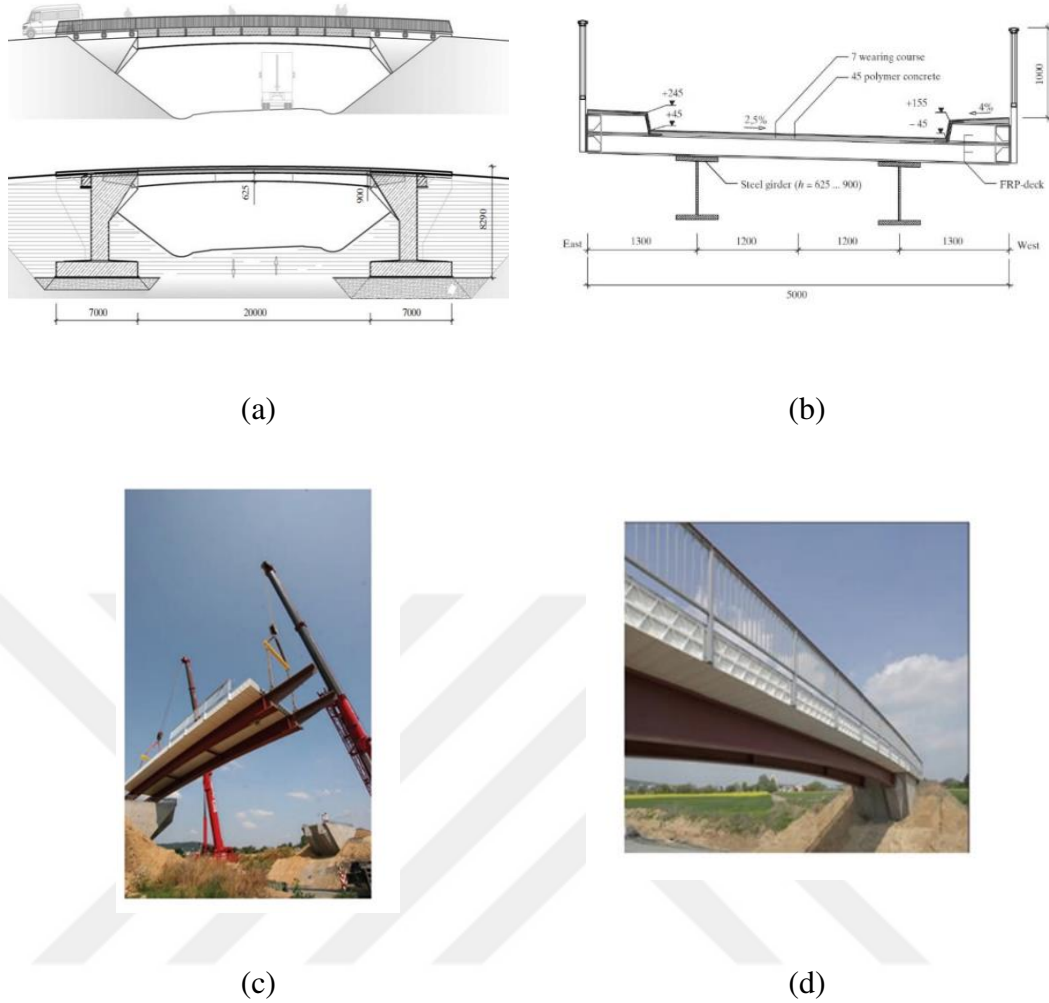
Bridge structure (a) FRP bridge in Friedberg (Hessen—Germany); (a) Elevation and longitudinal section, (b) Standard cross section of composite superstructure, (c) Mounting of superstructure on construction site, (d) Front face of superstructure
